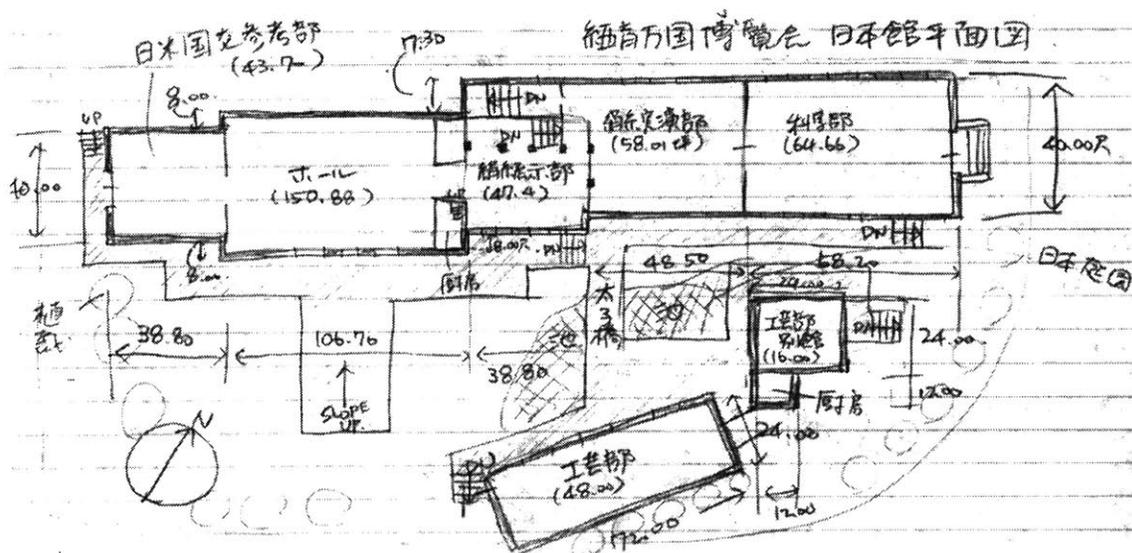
Japanese pavilion -preliminary plan (unrealized)
